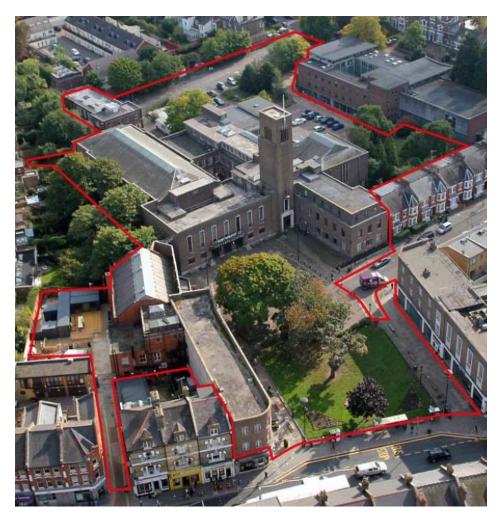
A – Existing Site – Historic Aerial Image (Red Line plan indicative)
